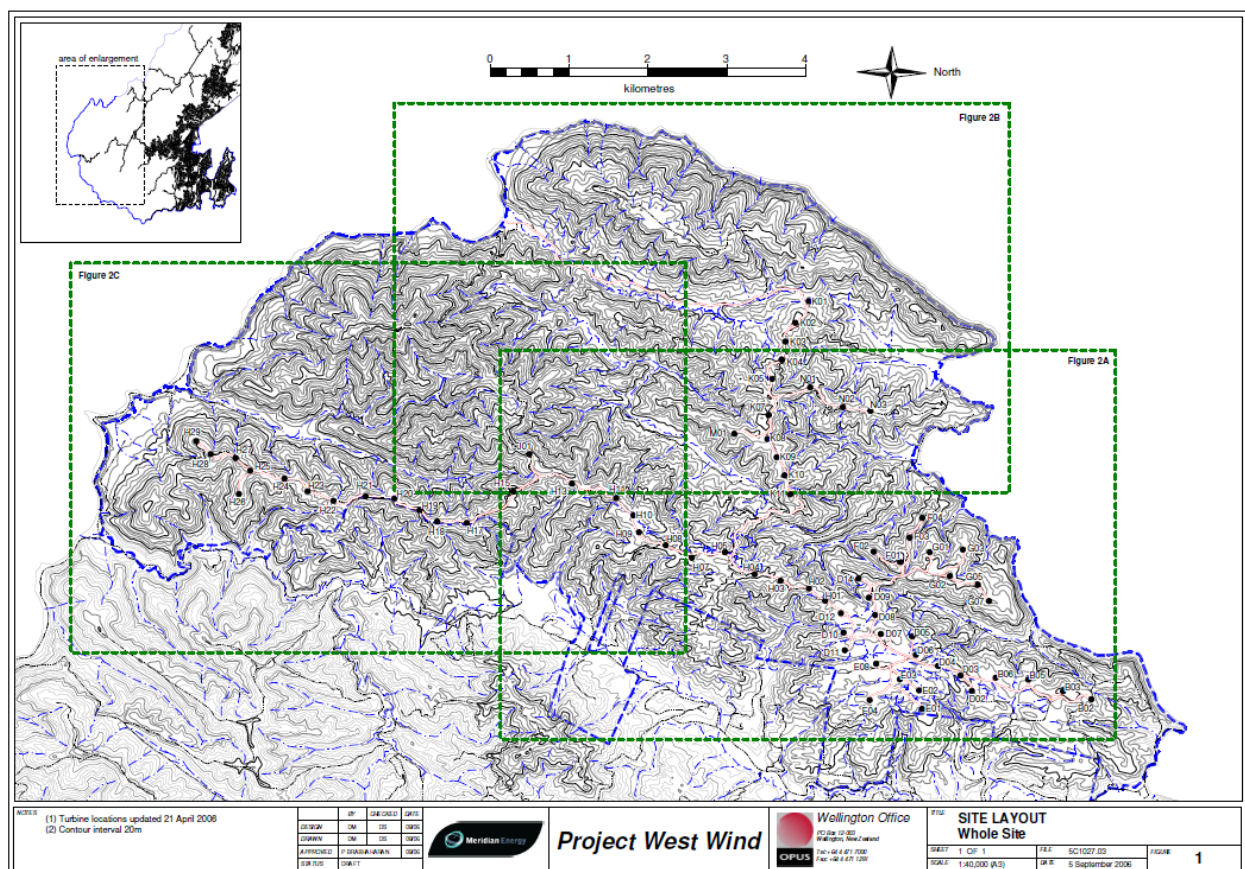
Site layout of the West Wind Windfarm, Wellington, New Zealand (Mason, 2006).
